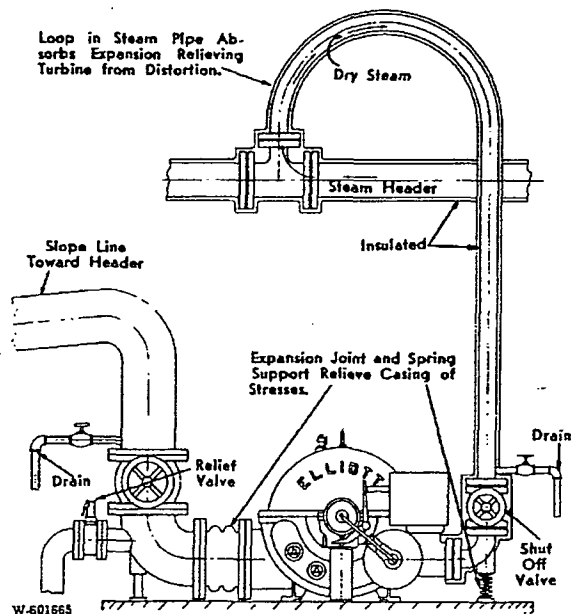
RECOMMENDED STEAM AND EXHAUST PIPE ARRANGEMENT
